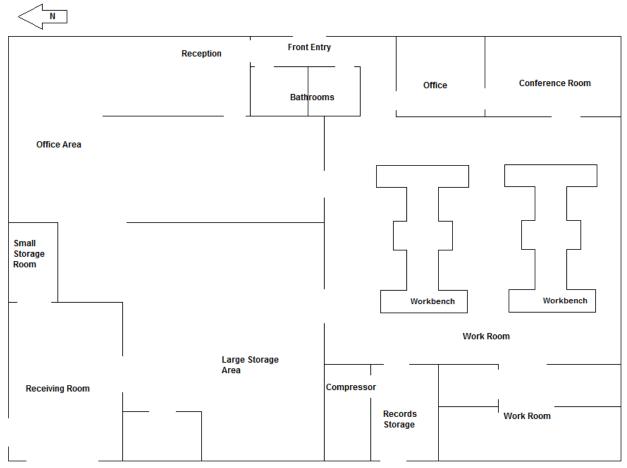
Layout of 2135 Airport Road Metro Aircraft Instruments Building
